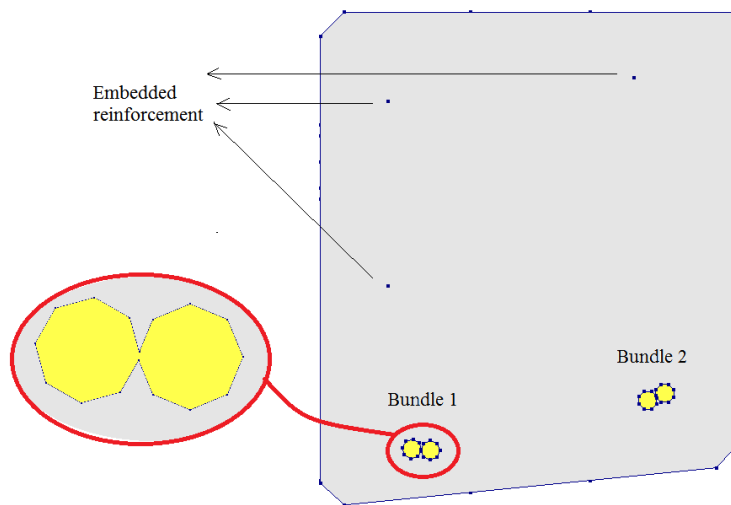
H5 beam cross-section, showing bottom reinforcement bars merged with two nodes describing a bundle, top and middle reinforcement modelled as embedded.
